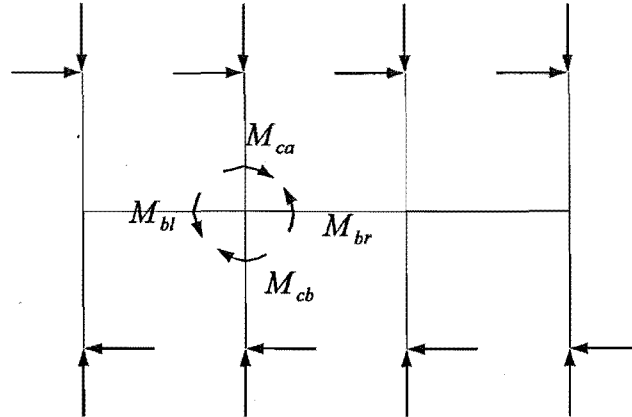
Bending Moments Acting at a Beam-Column Joint at a Floor Level
